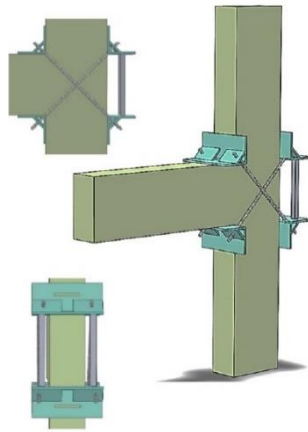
Concrete column-beam rehabilitation technique proposed by Yurdakul et al. (2018)
